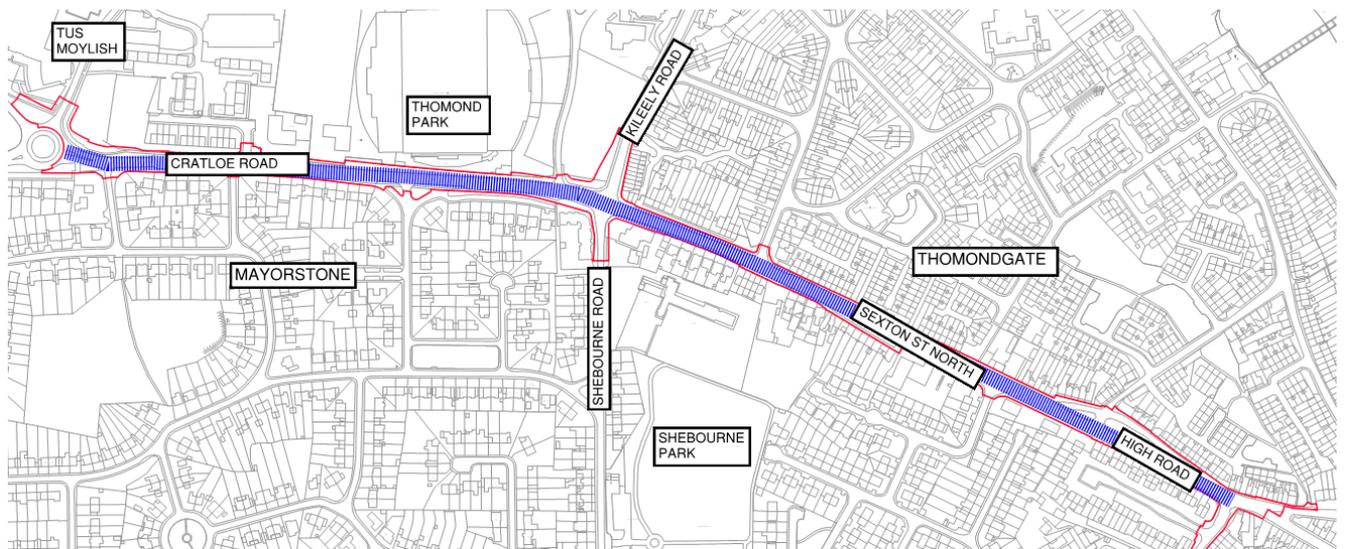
Existing Road Network from Moylish Roundabout to High Road
